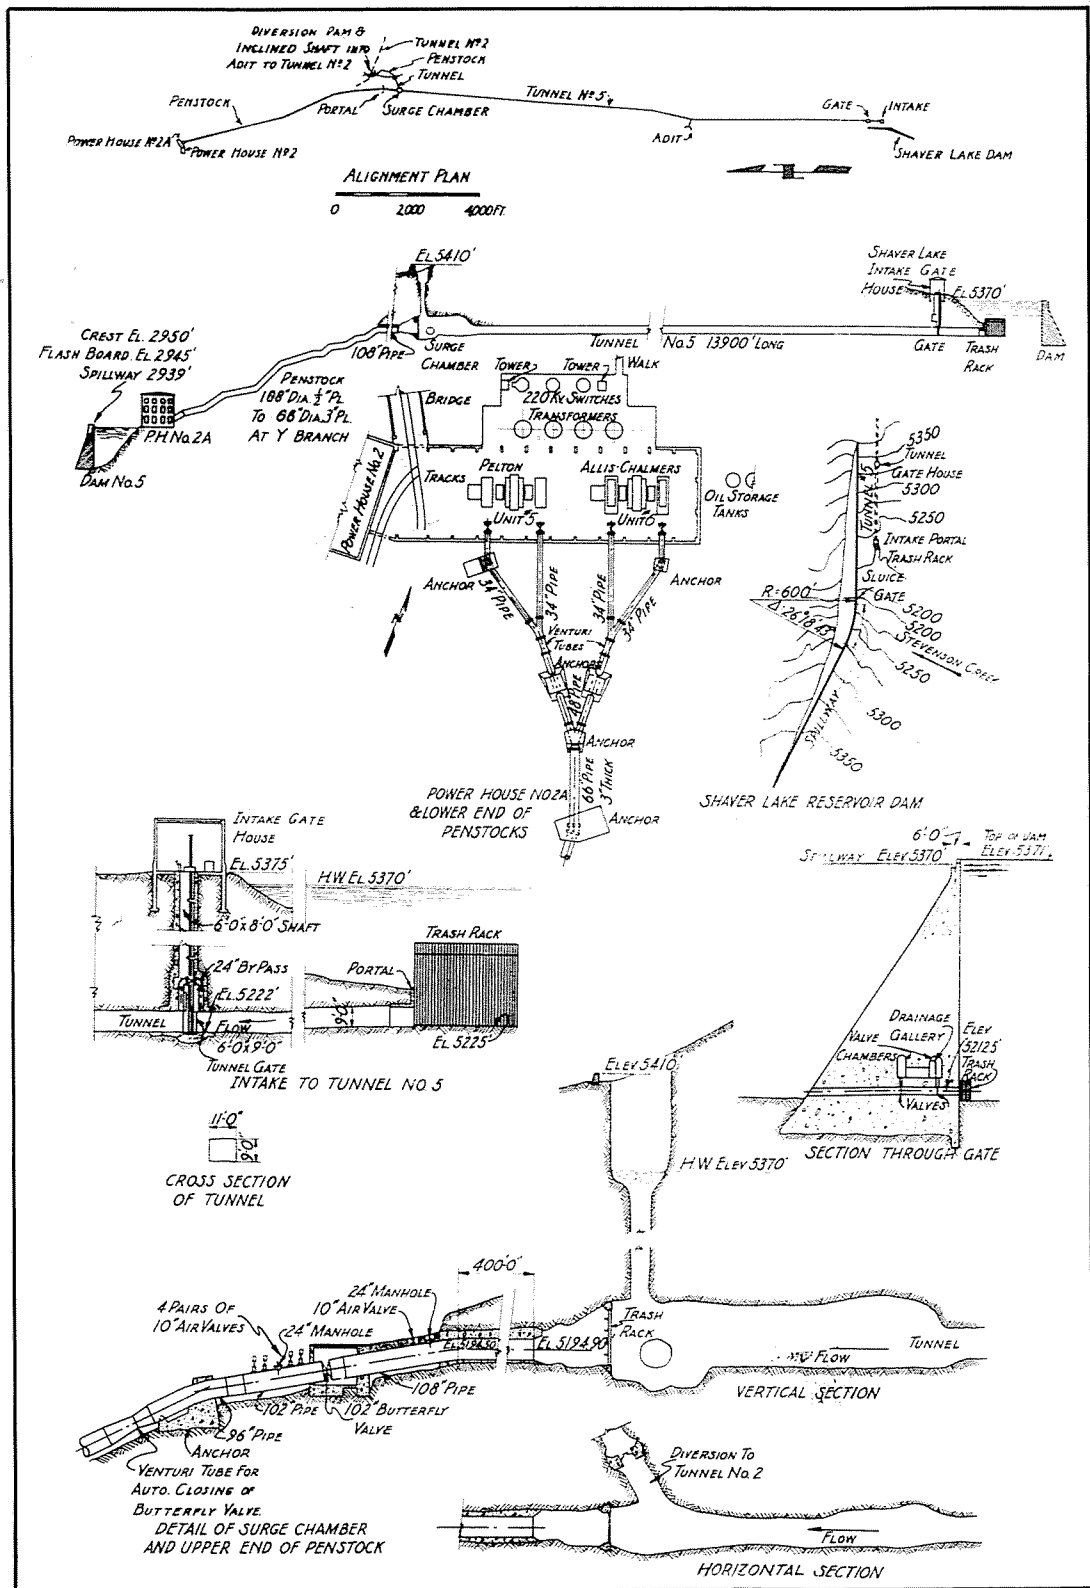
Figure C Powerhouse No. 2A hydraulic plan with details of Tunnel No. 5, Shaver Lake Dam, and intake and generating units (SCE 1928b:B10-6).
